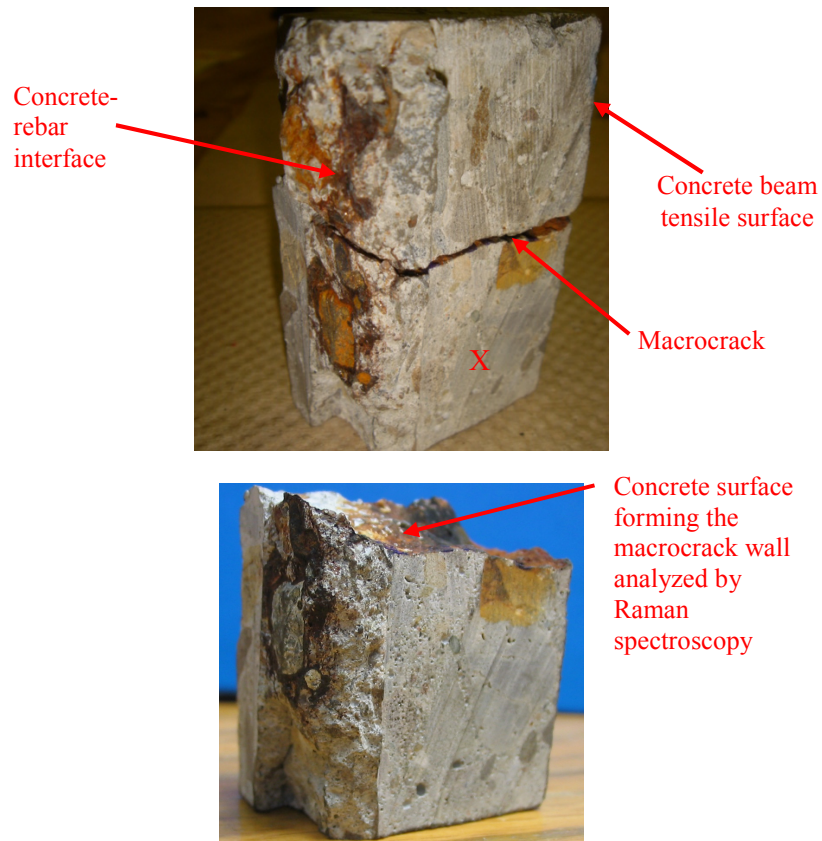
(a) A photograph of a section of dynamically loaded OPCC beam showing the macrocrack and the location of the rebar and (b) shows the section labelled X in (a). The concrete surface forming the crack wall is identified in (b).
